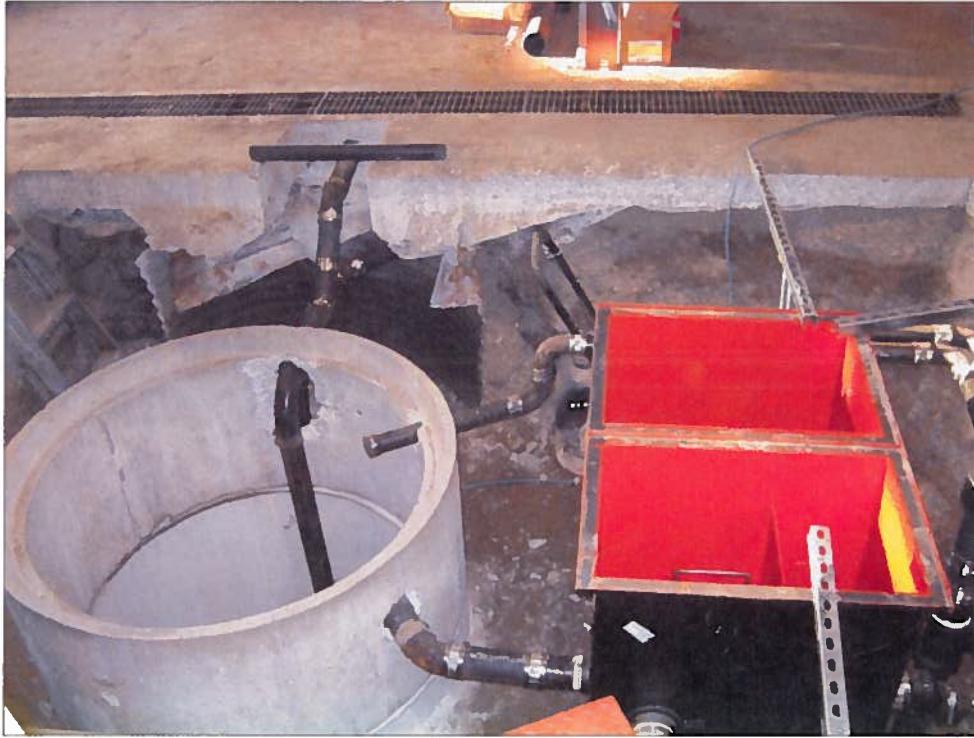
Final limits of excavation prior to oil water separator system installation
